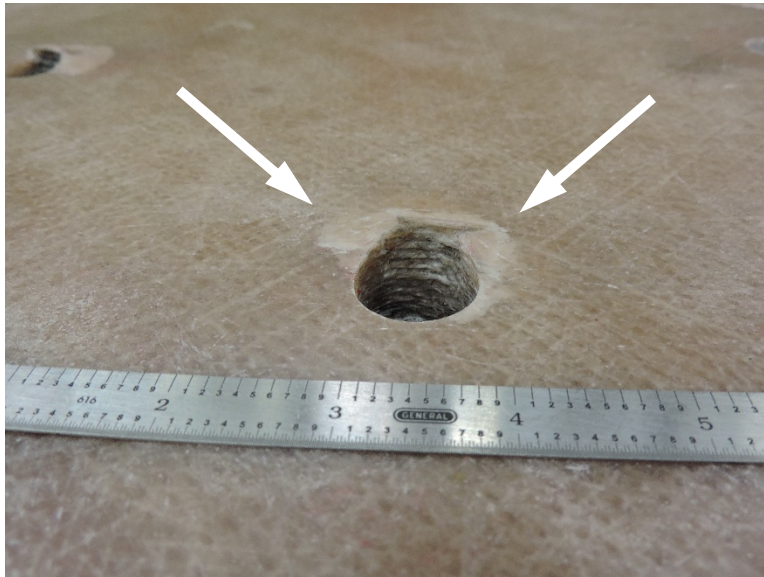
Bearing Failure at Bolt Hole Location of Specimen GP-1 Top Facesheet
